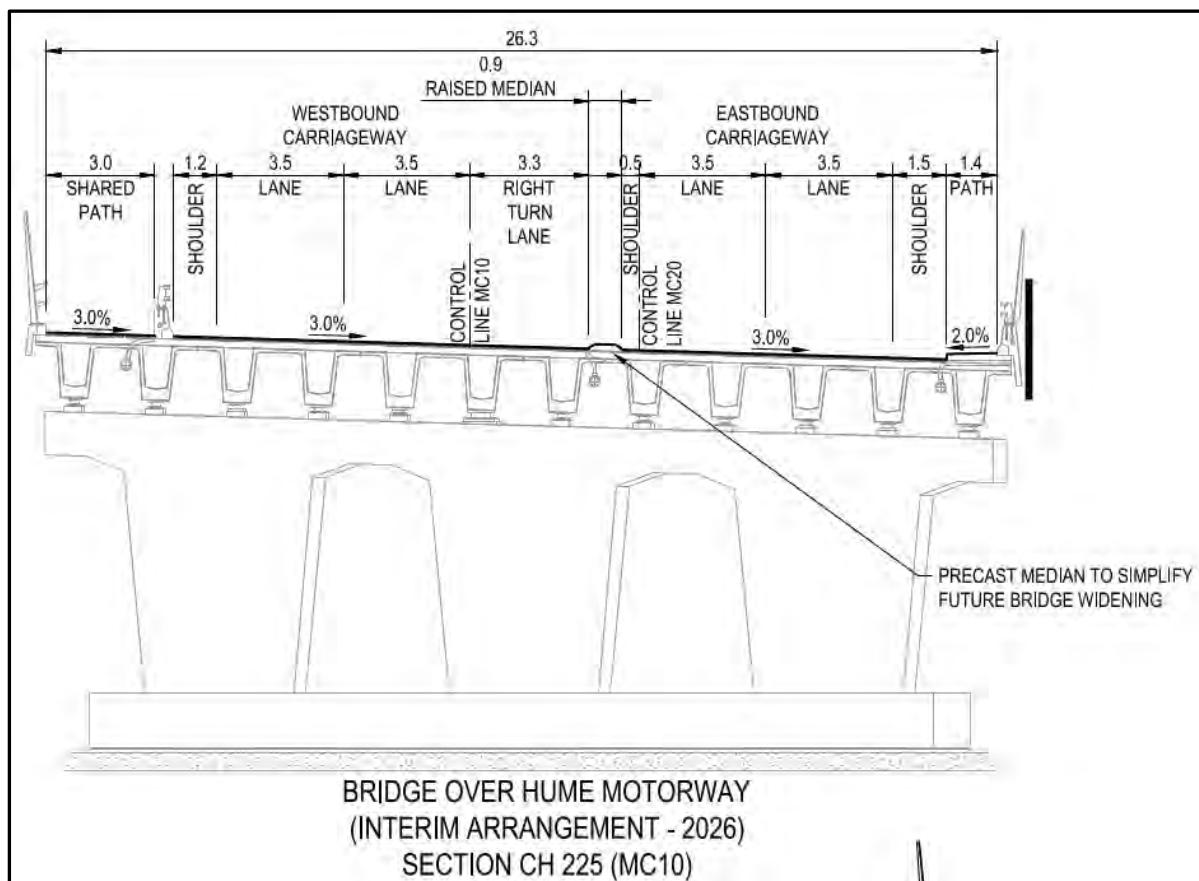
Proposed new bridge cross section arrangement in 2026
